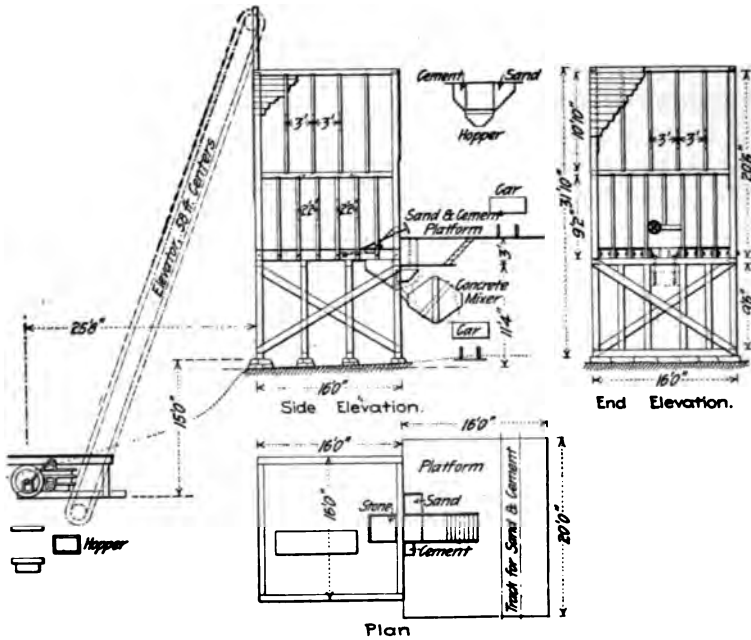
Stone Crushing and Concrete Mixing Plant.
